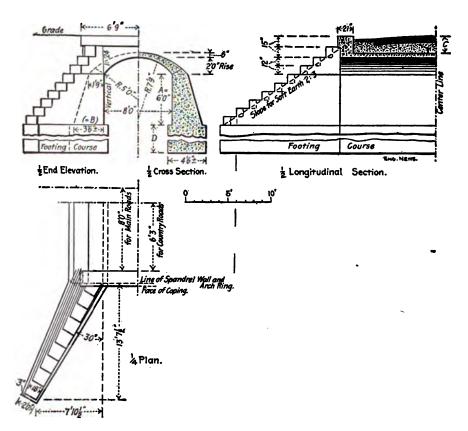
Plans of Eight-foot Plain Concrete Highway Culvert, Porto Rico.
